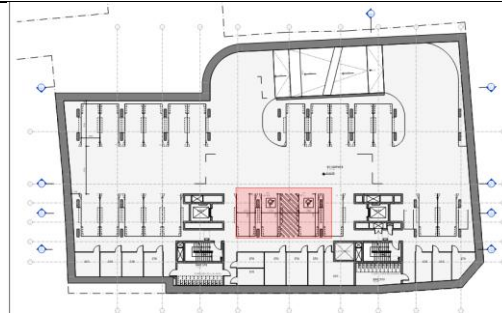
| Mark-up of the pedestrian link from the carpark to the building required to be accessible |Source: Smart Studio Design architect B2
